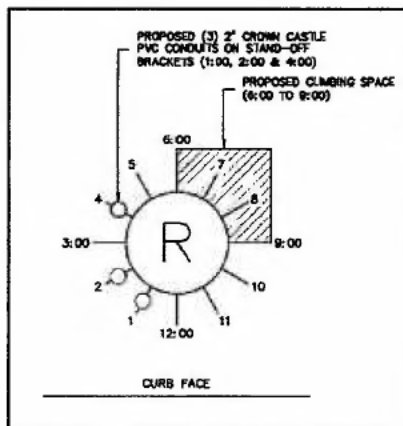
Inverted pole configuration (Source: Plans A-1 Panel 3).
